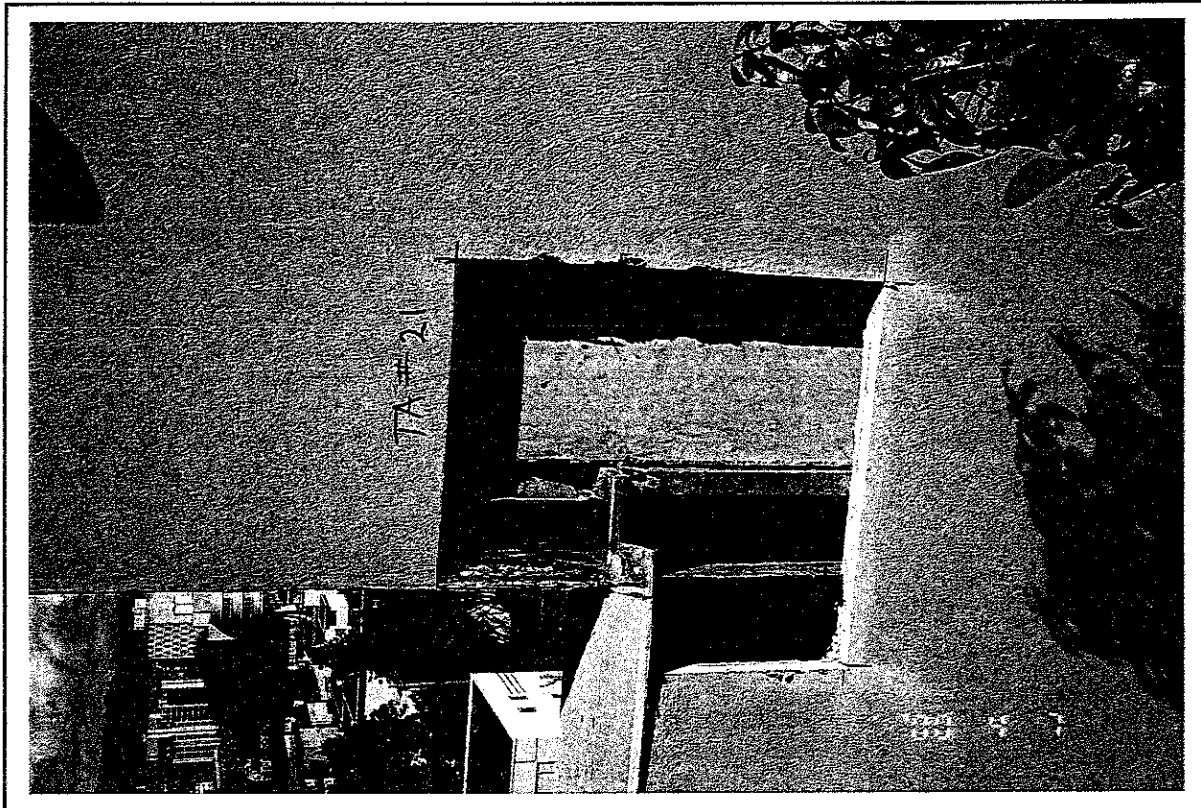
Test Area #21 – Corrosion at saddle interface of 1003
